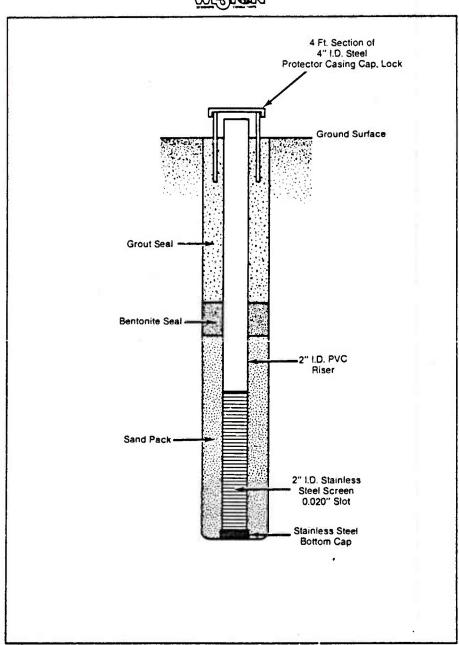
TYPICAL MONITOR WELL CONSTRUCTION
